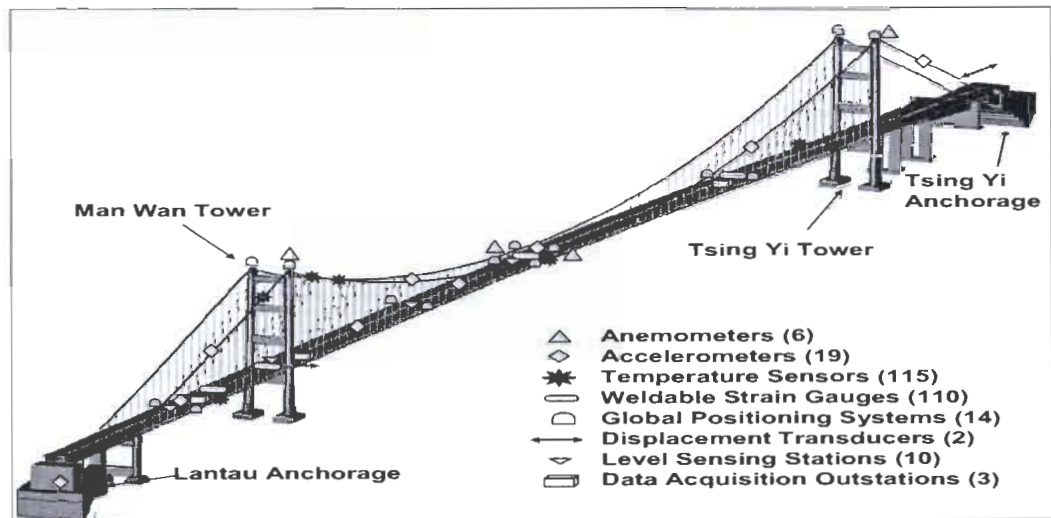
Layout of Sensory Systems and Data Acquisition Units in Tsing Ma Bridge
